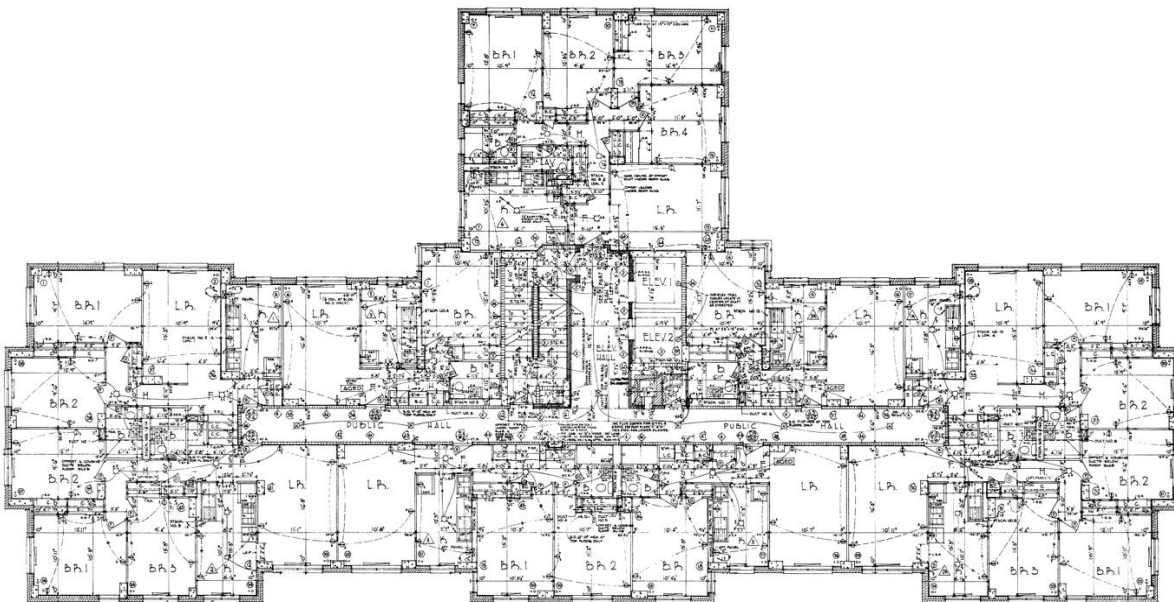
Typical upper-floor plan, 1966. (NYCHA)
